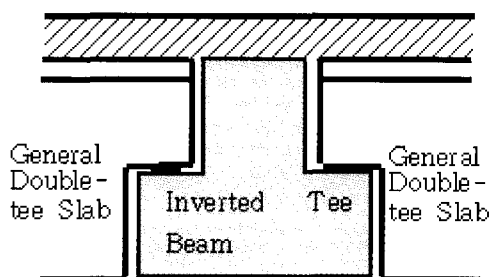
Connection of inverted tee beam and double-tee slab with general dapped ends
